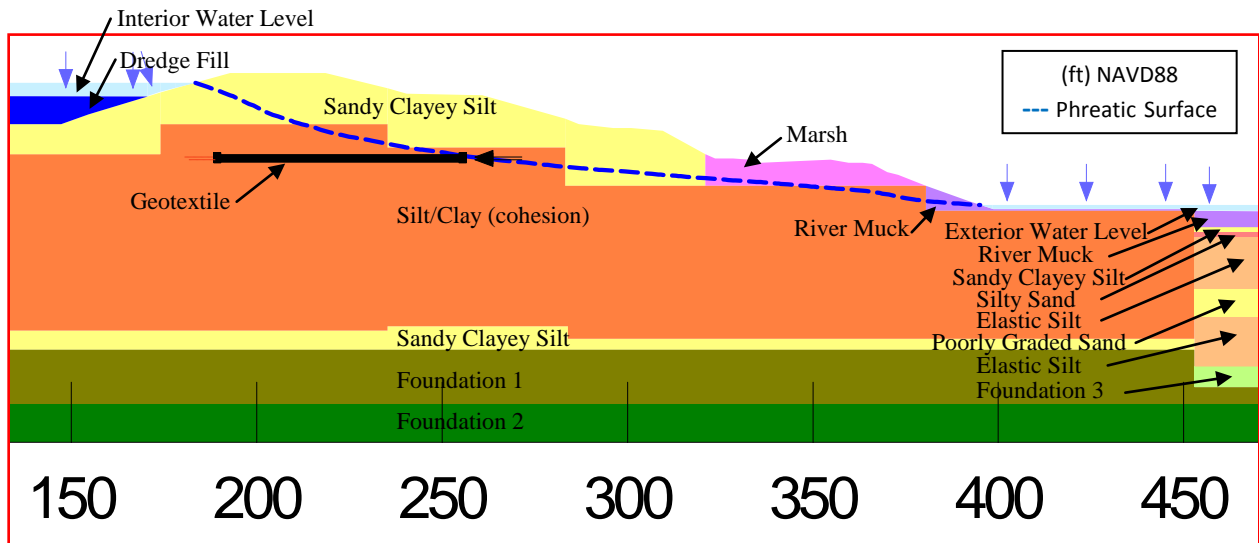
Geometry of soil layers for cross-section 2, existing condition.
